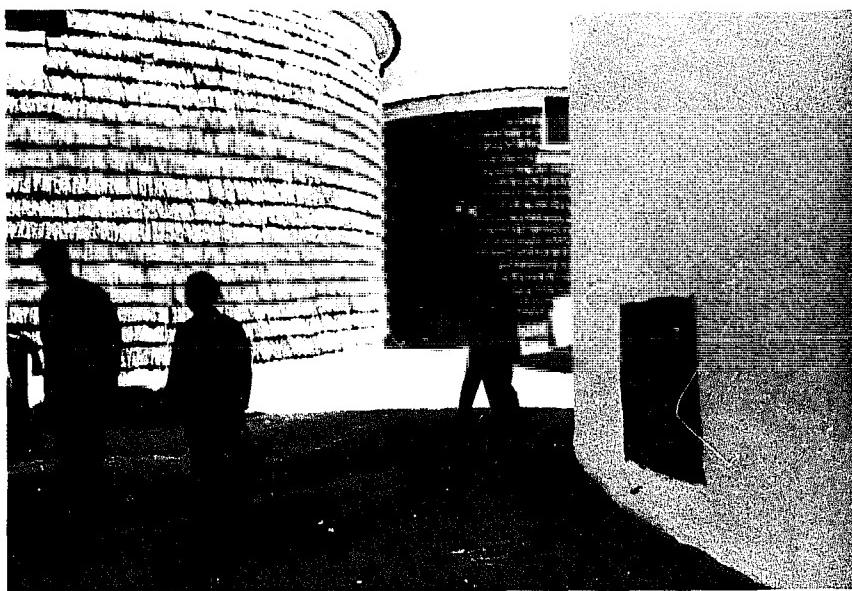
Alternative method of waterproofing silo walls. "Fringes" of rice straw are fixed on the clay/straw wall. (South Gate Depot)
